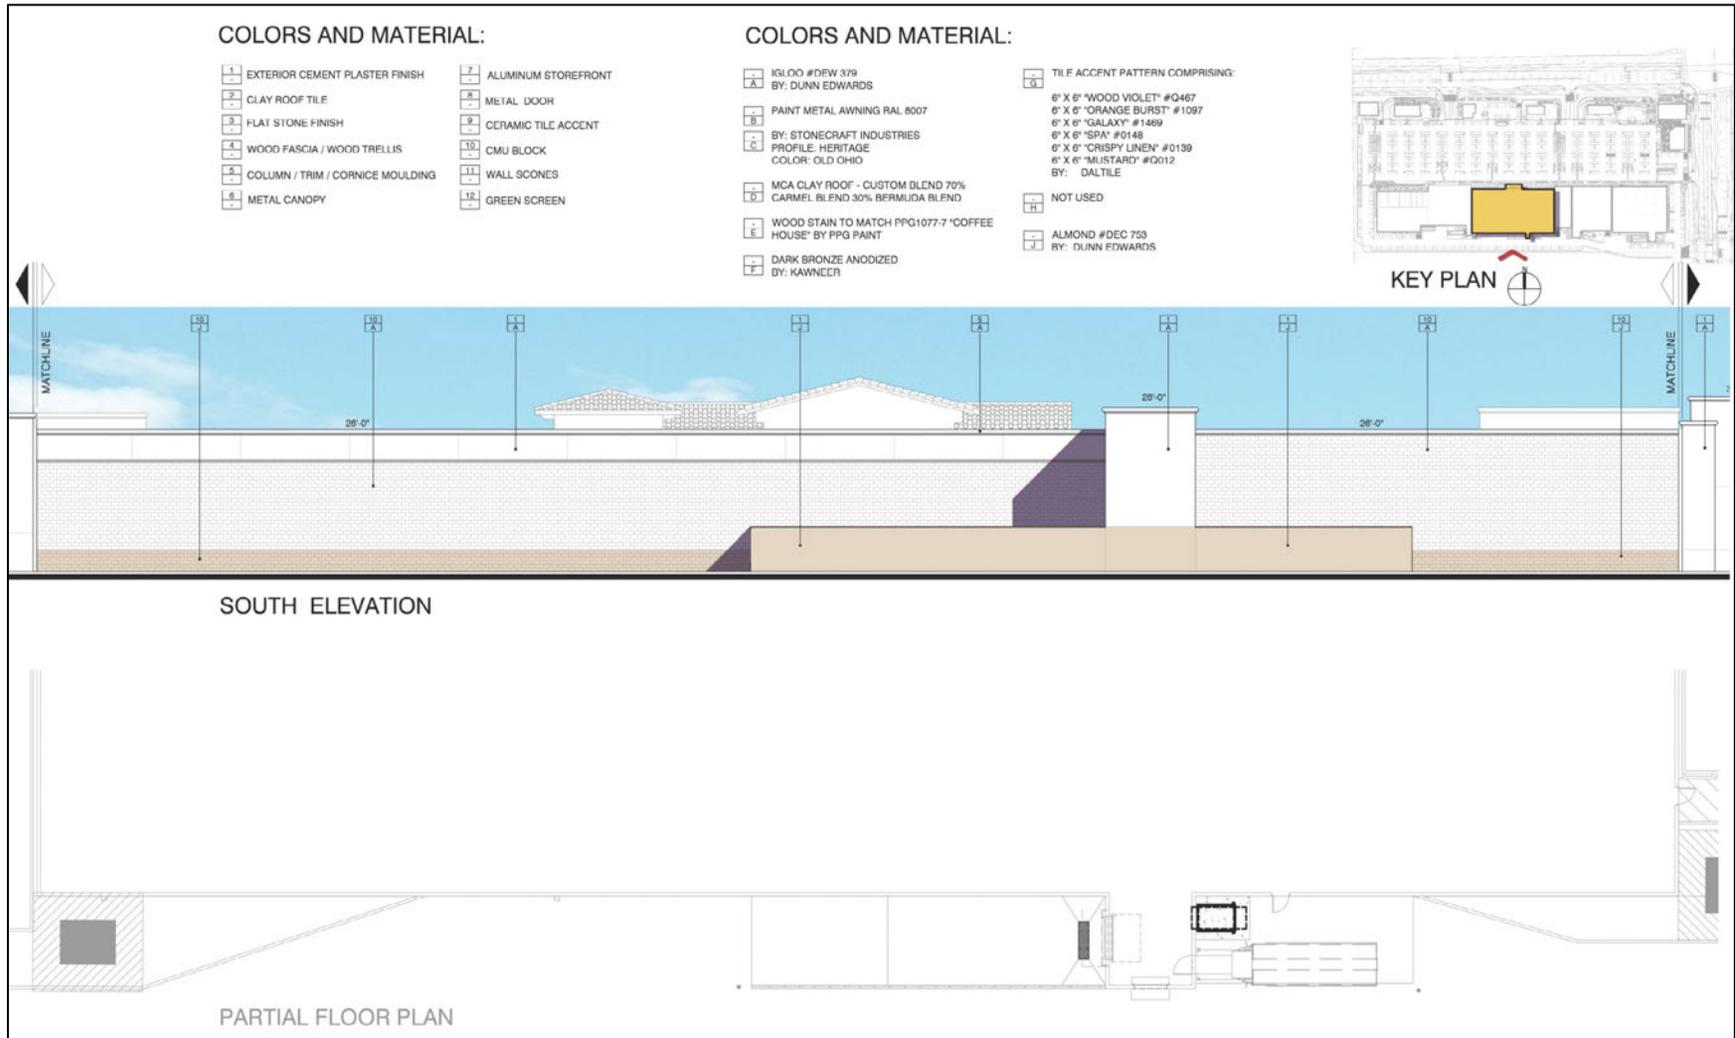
Exhibit D: ELEVATIONS CONTINUED – MAJOR BUILDING 2
